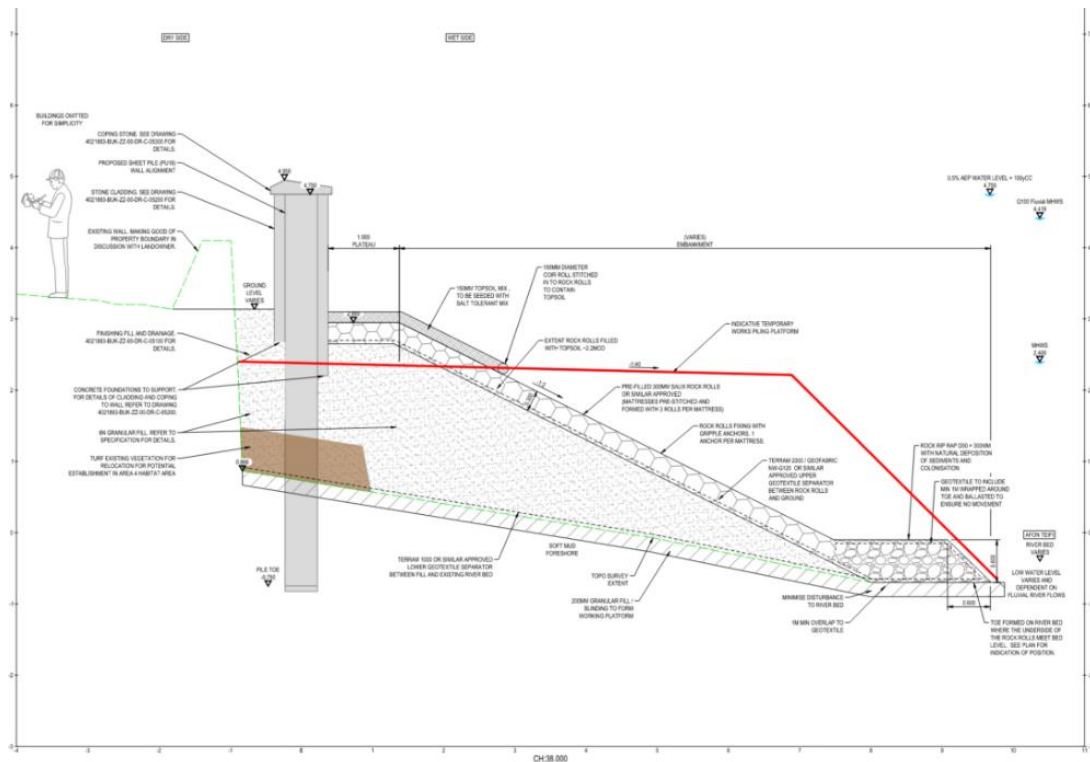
Typical cross section of the engineered riverbank with red line showing the indicative extent of the proposed temporary piling platform
